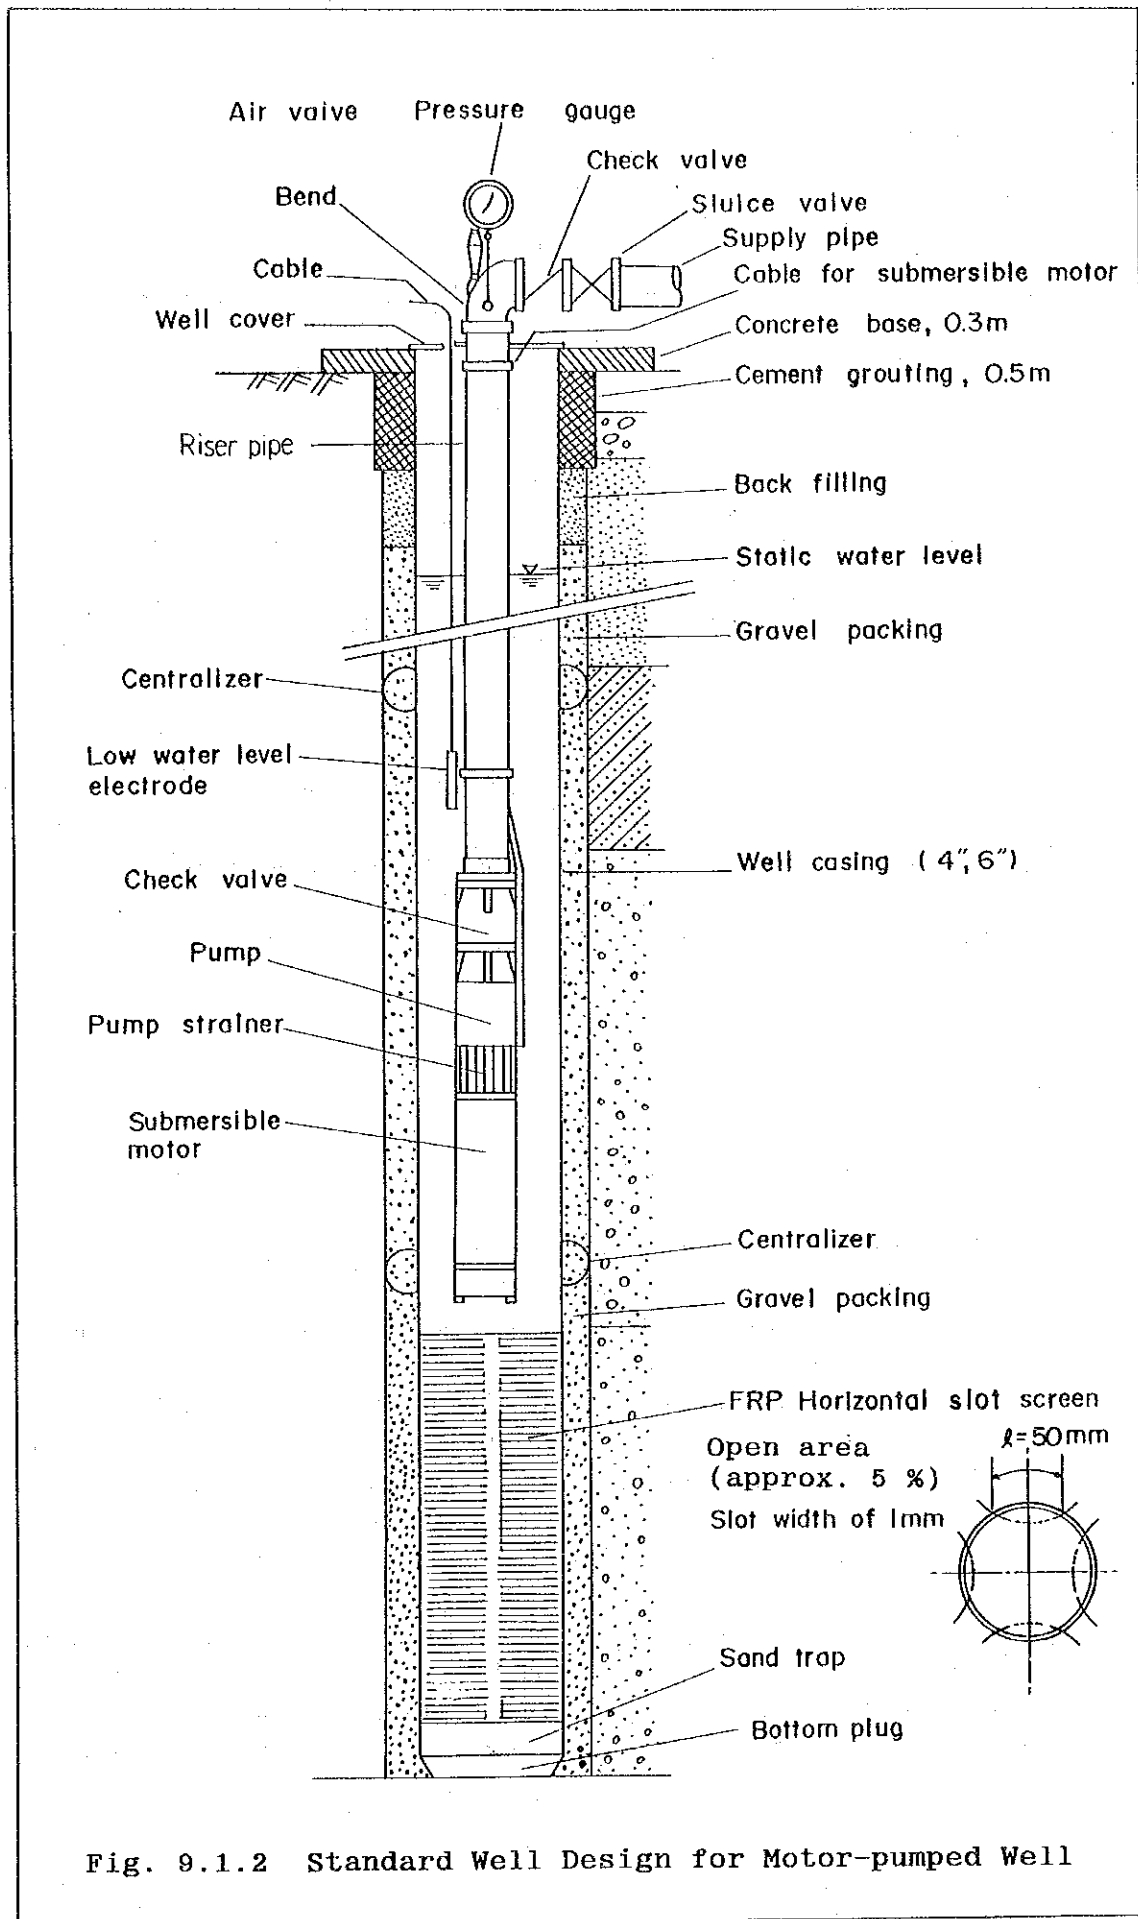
Standard Well Design for Motor-pumped Well
